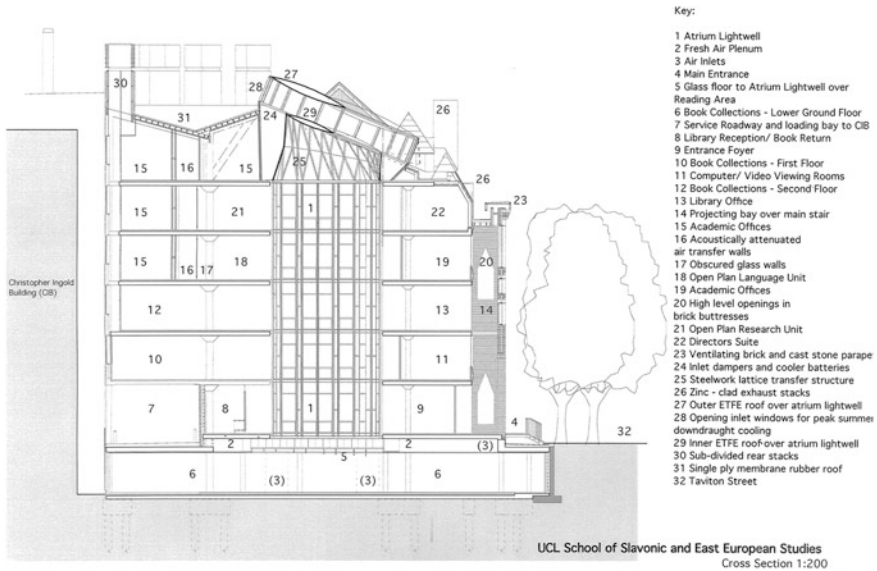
Cross-section of the SSEES Building, UCL, London
